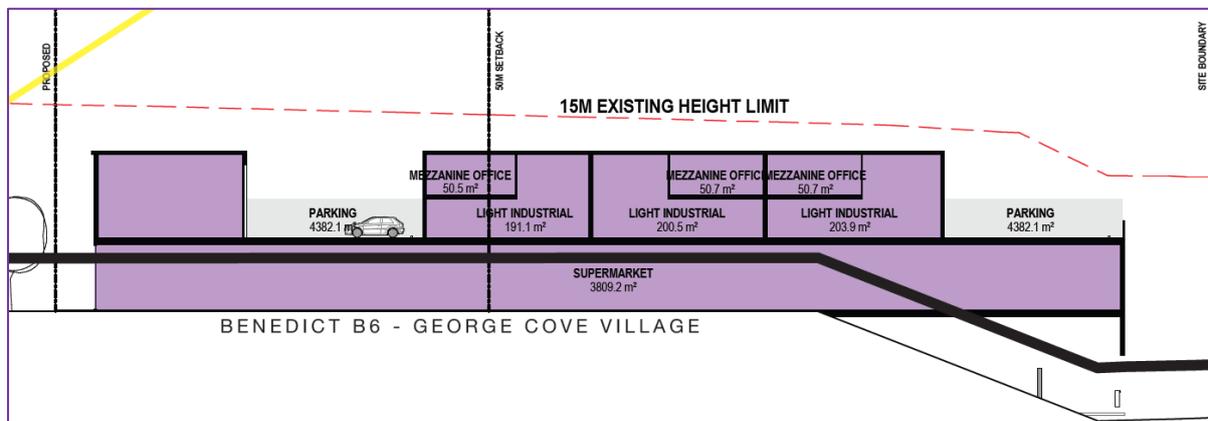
Side view of proposal looking west (Source: Rothelowman Planning Proposal Design Report)
